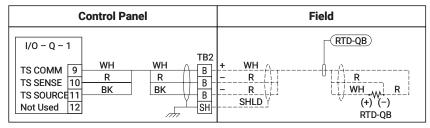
Typical RTD installation from the NGC-40-IO module in a North American style panel
